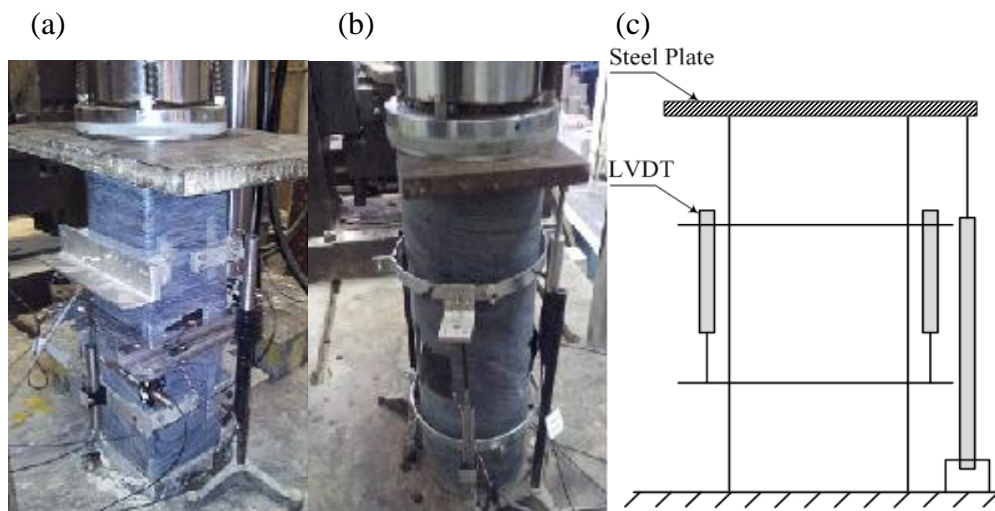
Instrumentation and test set-up: a) Specimen SF - b) Specimen CF - c) LVDTs Configuration.
